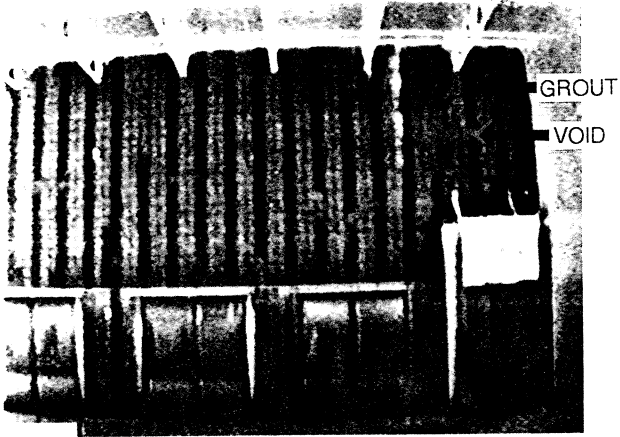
Infrared image of grouted and reinforced concrete masonry wall.
